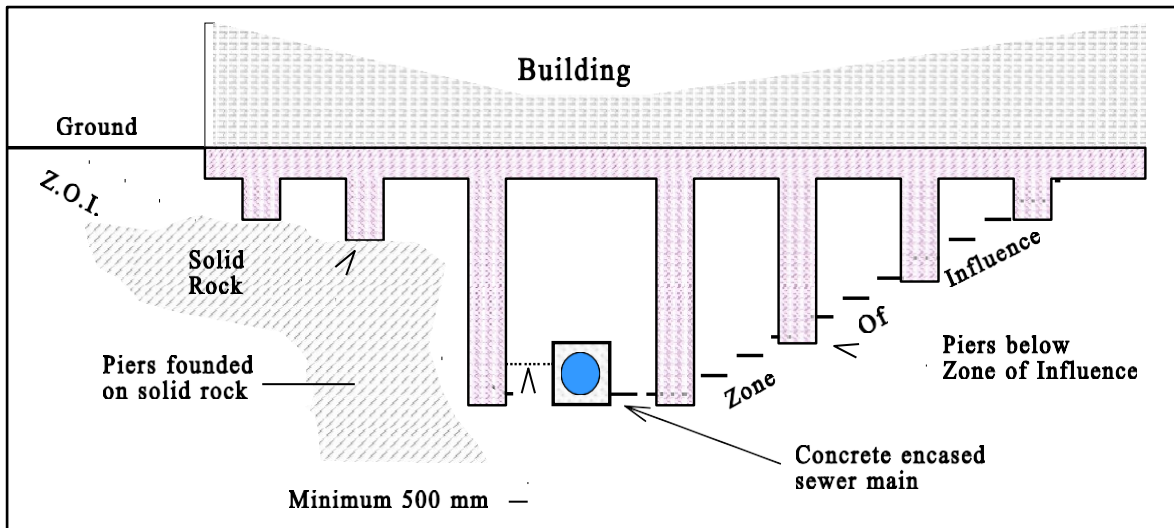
an example of “self-supporting foundations” for a building within a 2:1 zone of influence of a sewer main
